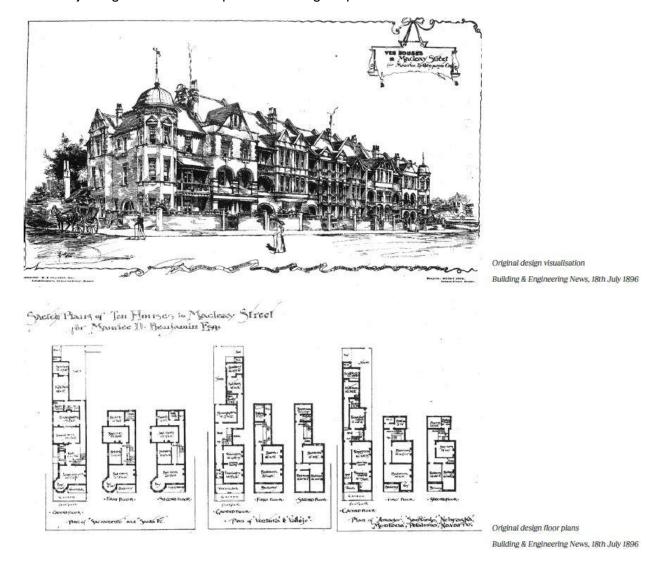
Original design visualisation (top) and floor plans (bottom) of the original terrace row
